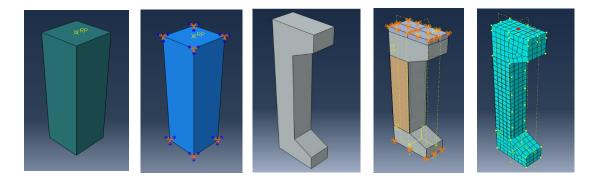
A typical steel reinforced concrete column strengthened with two layers of hoop wrapping
